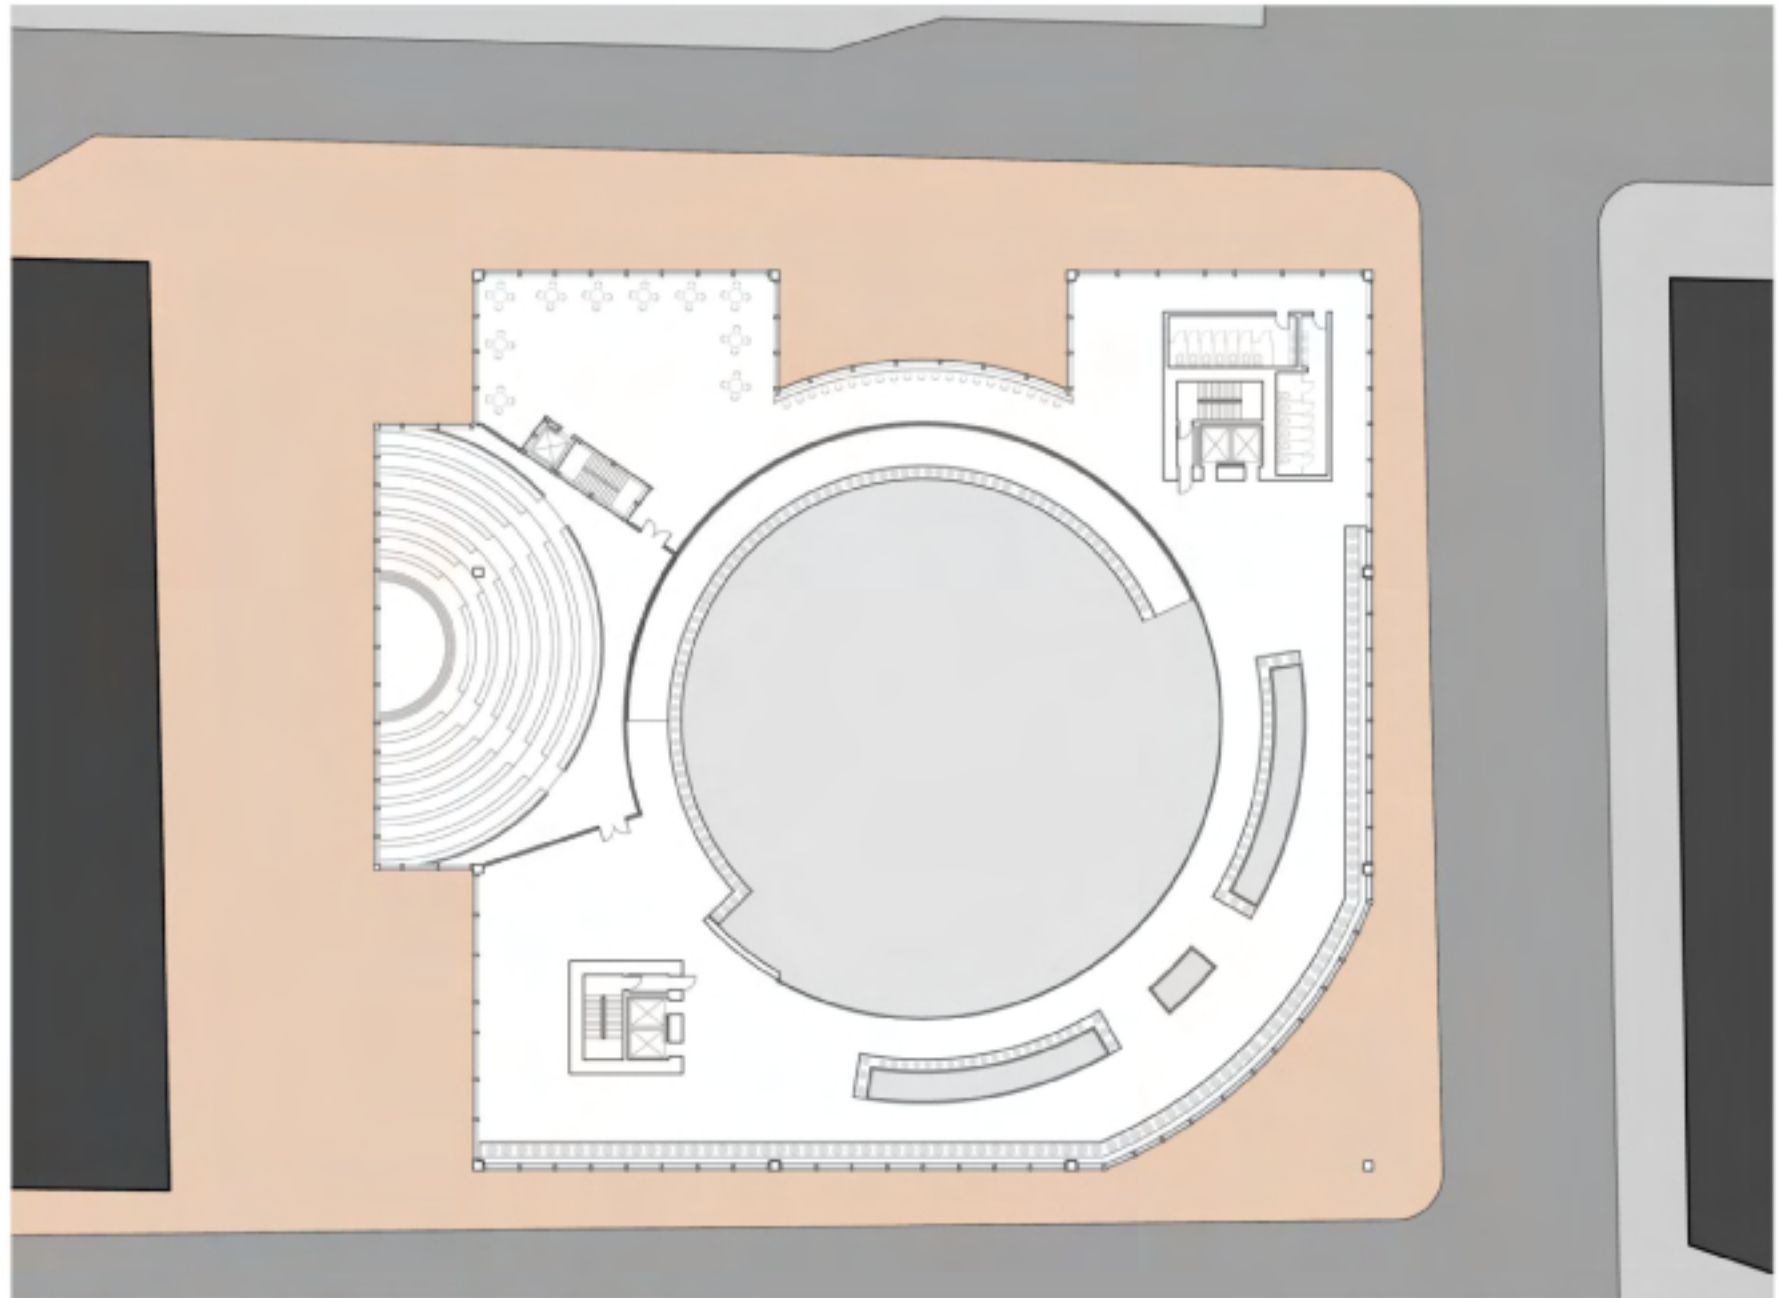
Third Floor Plan [Created using AutoCAD and Photoshop]
